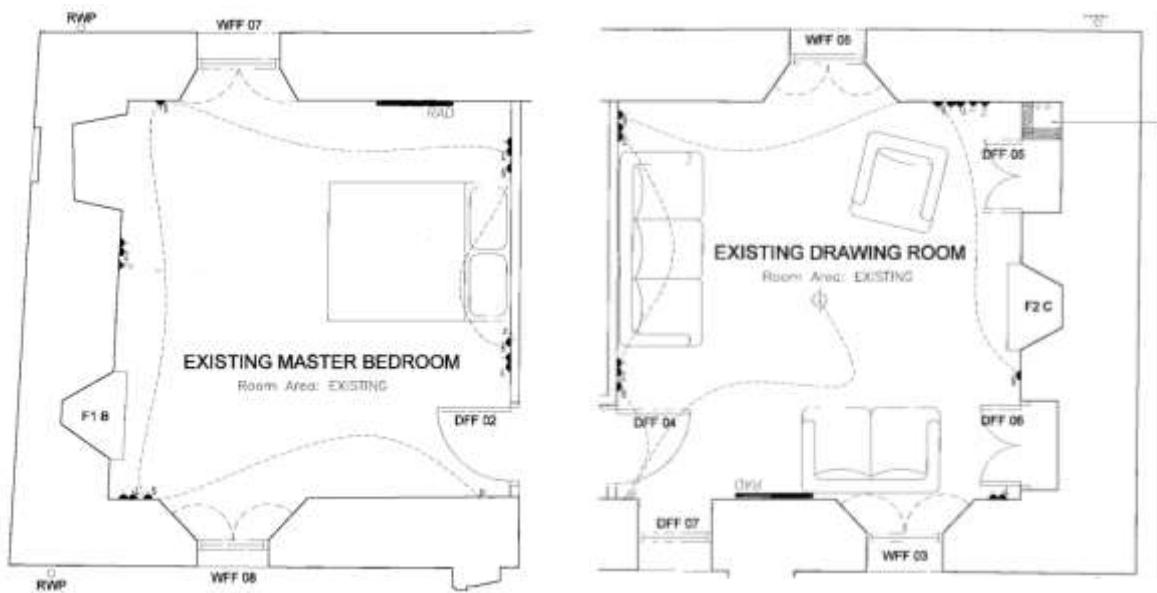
Upgrade plans for the master bedroom and drawing room on the first floor
